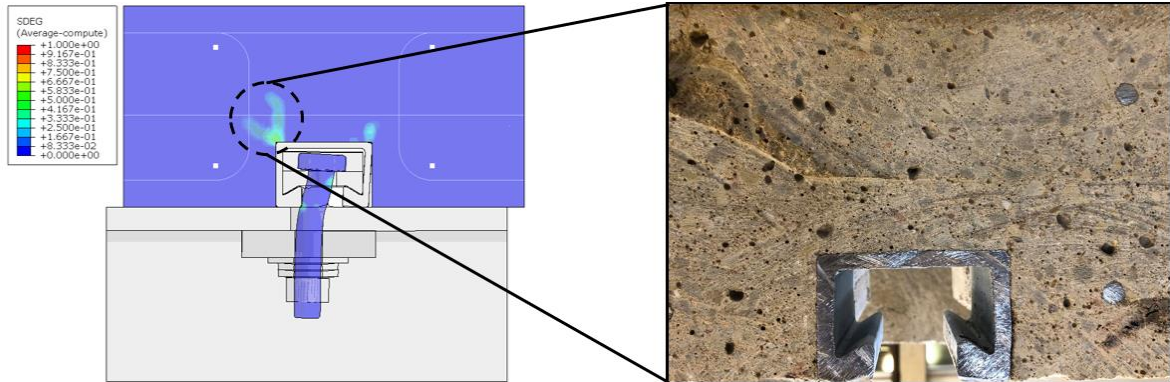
Concrete damage state at the load introduction zone
